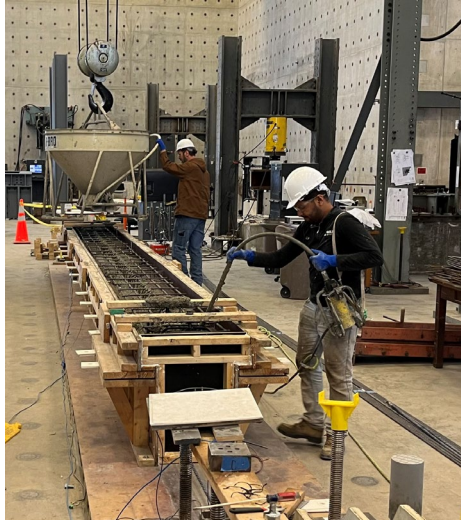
Formwork and reinforcing cages of beam specimens prior to casting.
